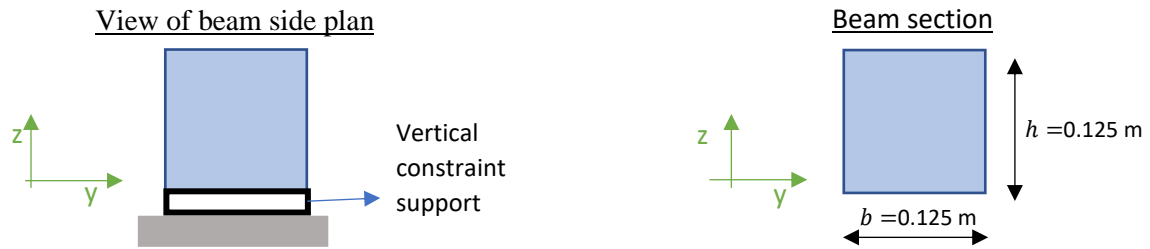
A) SIDE VIEW OF BEAM B) BEAM CROSS SECTION
